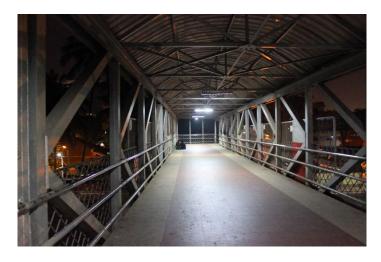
Foot over bridge at Shivaji Nagar Station, Pune
